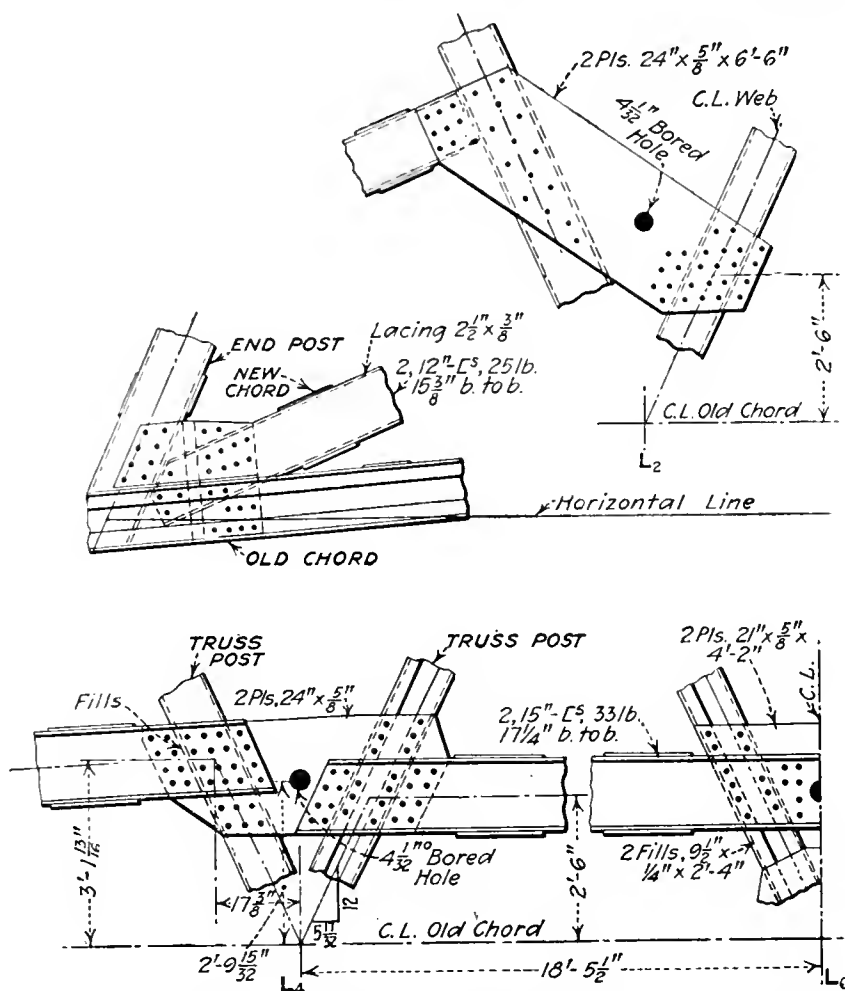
DETAILS OF NEW BOTTOM CHORD FOR TRUSS REINFORCEMENT
